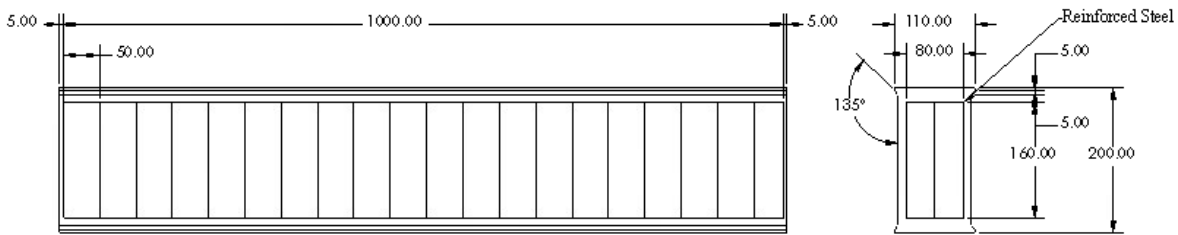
Study of Reinforced Concrete with Steel Bars in 2D Drawing (Dimensions are in mm).
